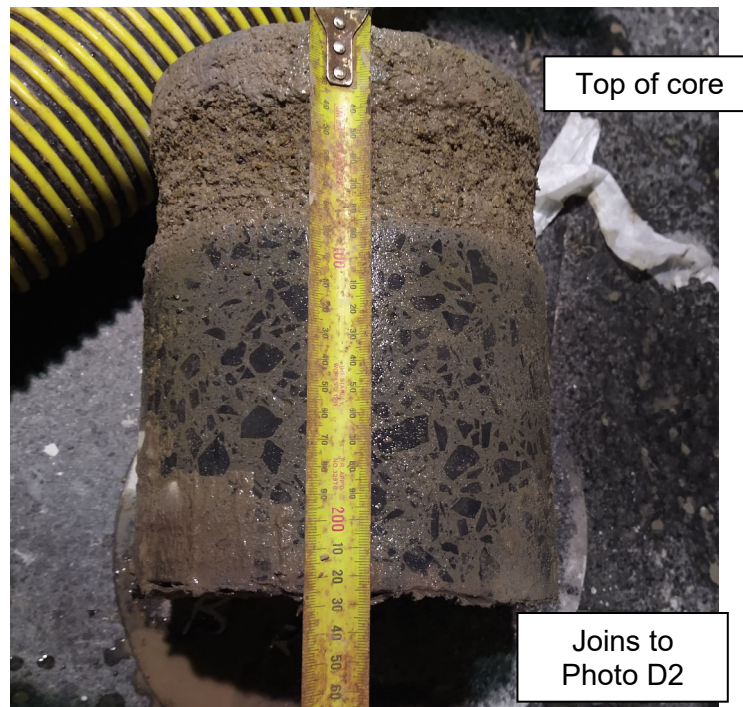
View of top part of concrete core from Borehole BH203, showing a cemented coarse sand matrix between 0.02-0.09 m over a concrete slab. Reinforcement steel (9 mm diameter) was encountered in the lower part of the slab at 0.22 m depth.
